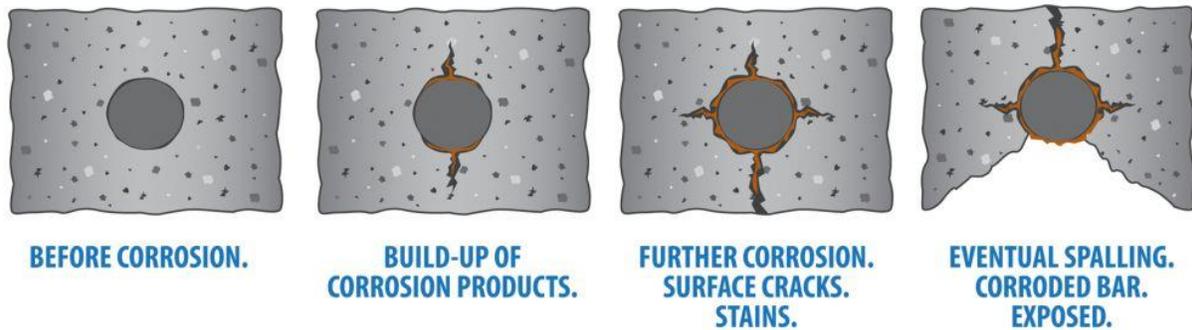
Reinforced concrete infrastructure corrosion. Image courtesy of TheConstructor.org.
